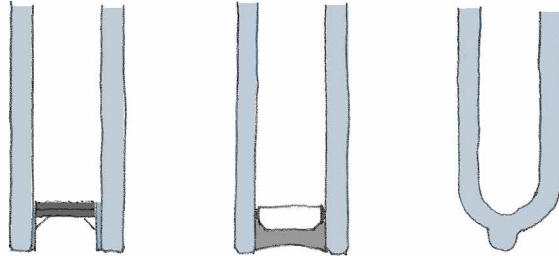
Soldered (a), bonded (b) and welded (c) IGU edge seal
